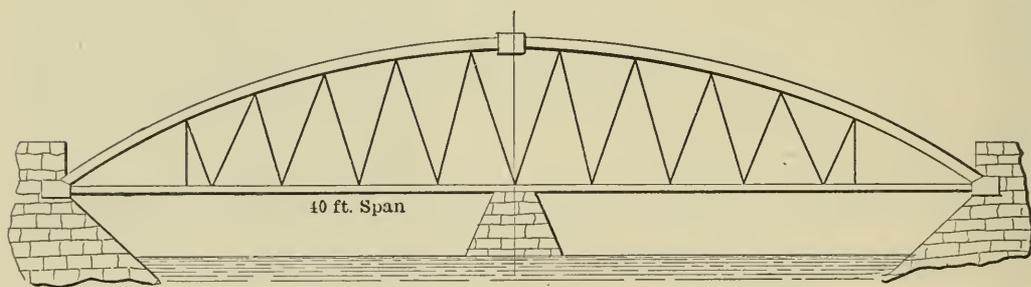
BRIDGE SPAN BUILT OF STEEL PIPE.
